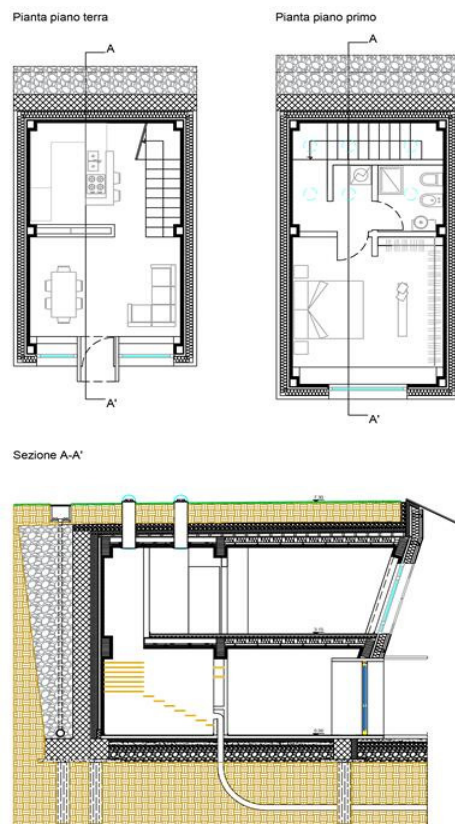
Plans and vertical cross section of the dwellings of 55 m².
